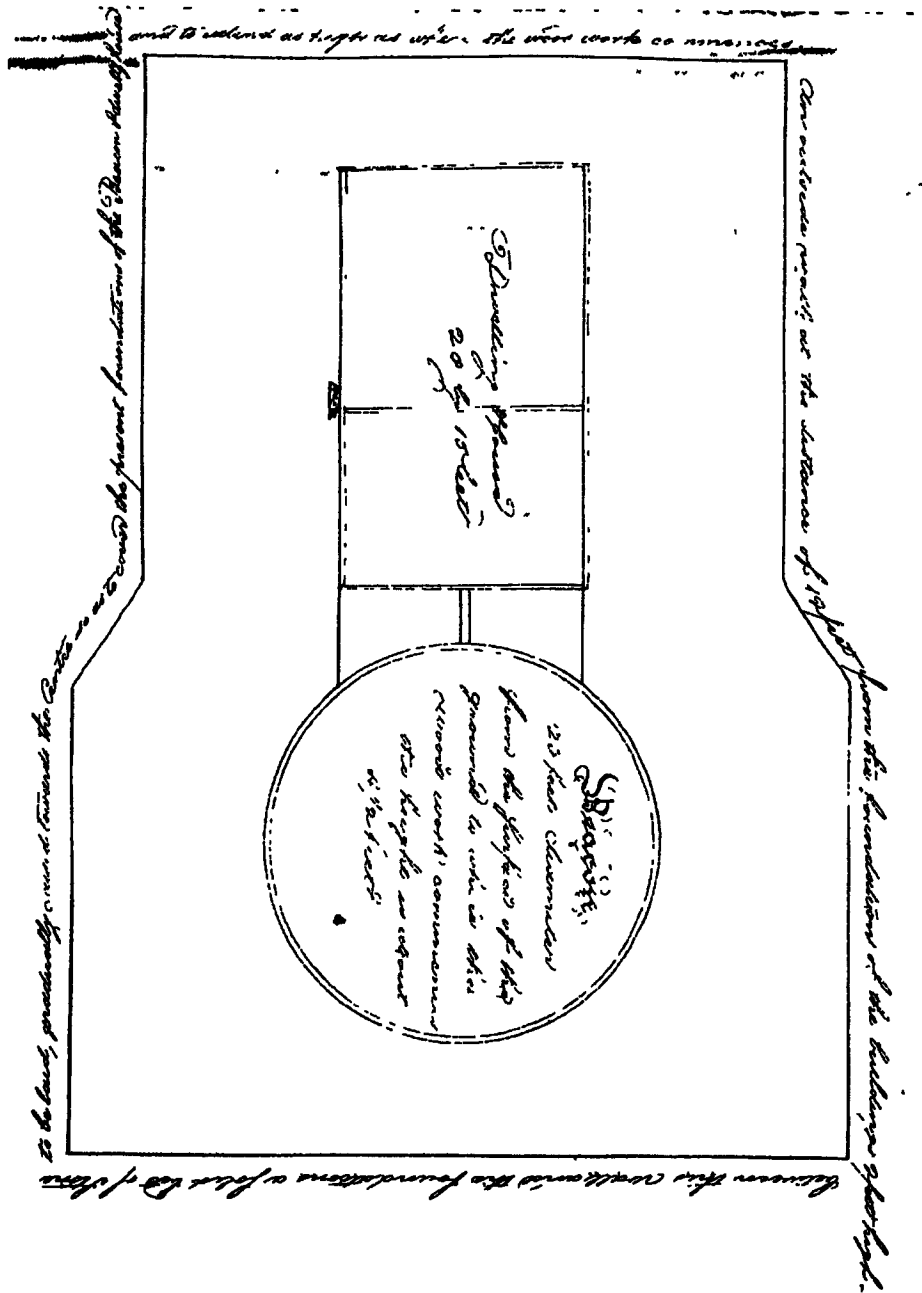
Plan for securing the foundations of Shell Castle Beacon. (Source: William Miller, Jr. to Henry Dearborn, 18 July 1801, Records of the Treasury Department, Deeds and Contracts, Volume 1, RG 26. NAB)
